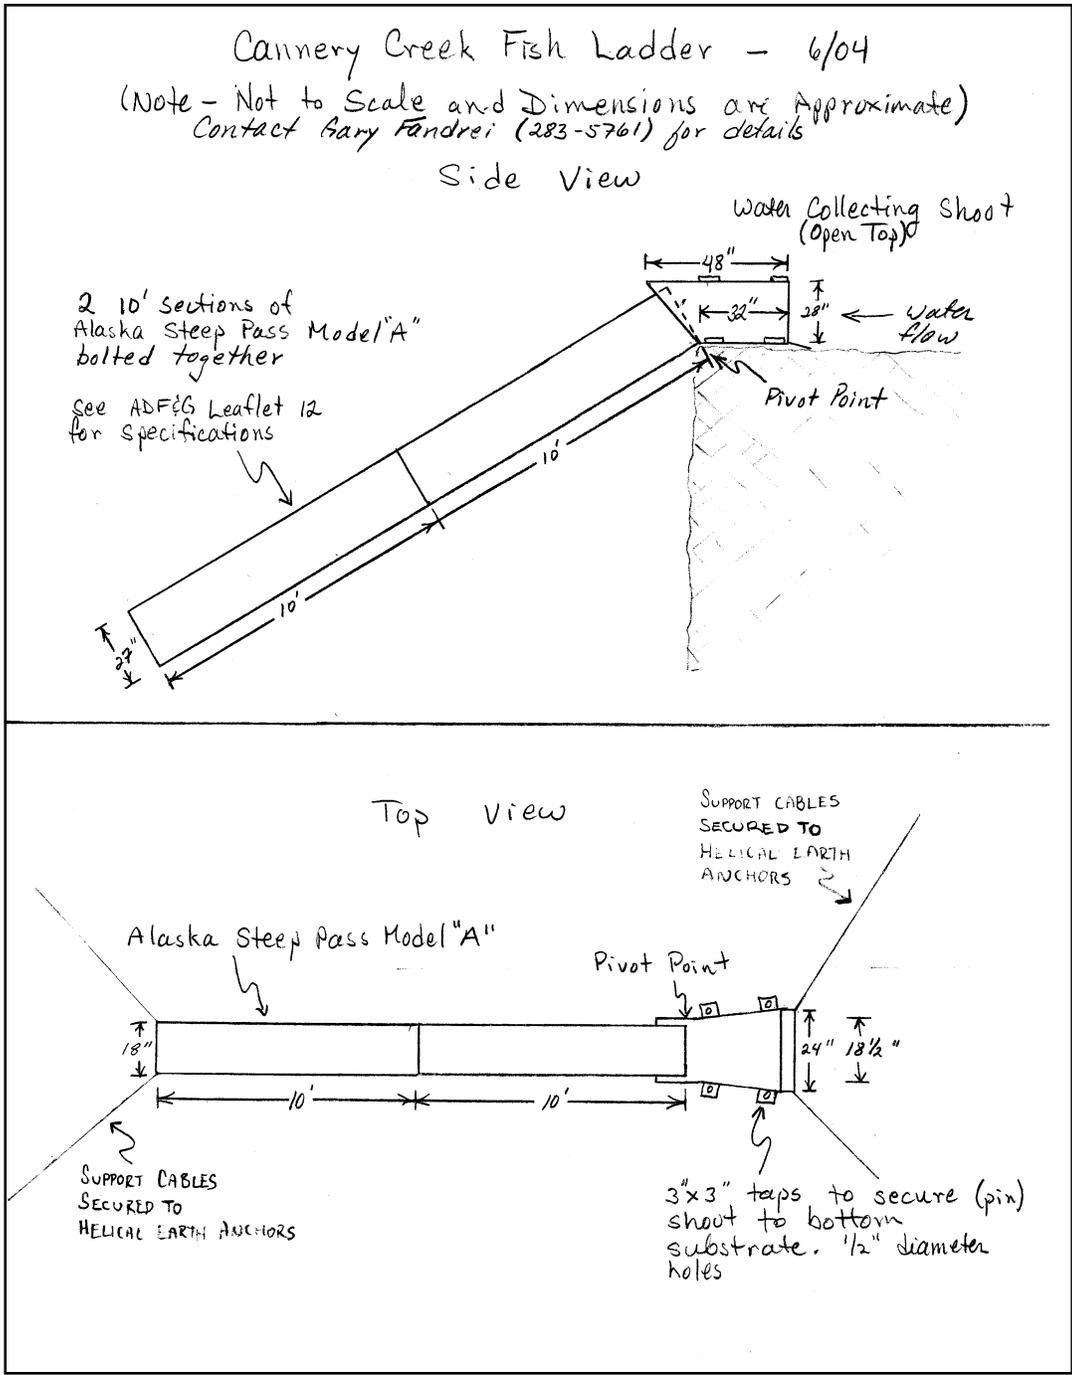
Sketch of Alaska Steeppass used at Cannery Creek. Note that the plans were changed from two 10ft sections to three 8ft sections.
